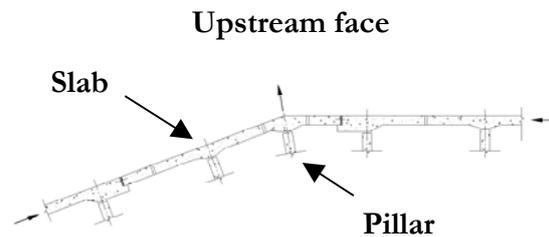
Sketch of “problem corner” on the Votna 2 dam (see Figure 3) where the front slab had been lifted away from the supporting pillars.
